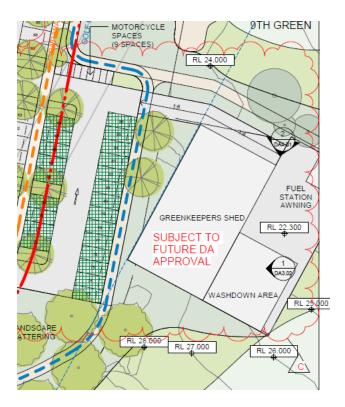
Extract from Current Architectural Plans (Source: Marchese Partners)
